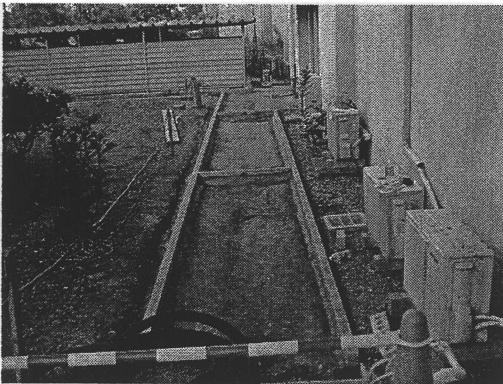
Provide construction joints to avoid shrinkage cracks
